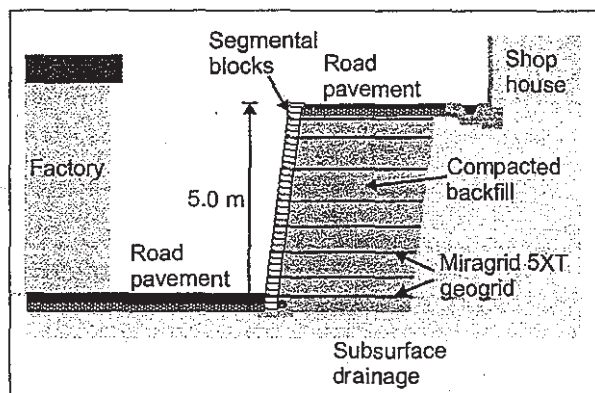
Geosynthetic reinforced segmental retaining wall, Belakong, Malaysia.
